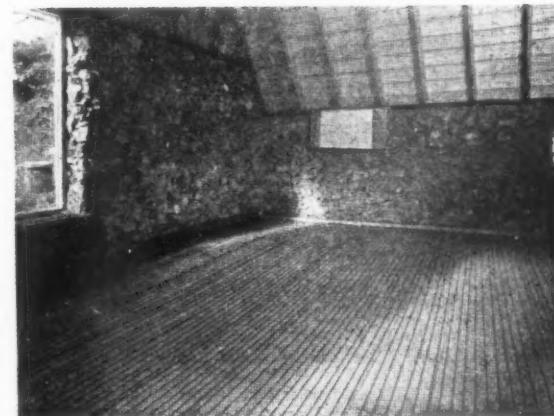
Layout of solidly embedded heating cable before application of top concrete screed.
